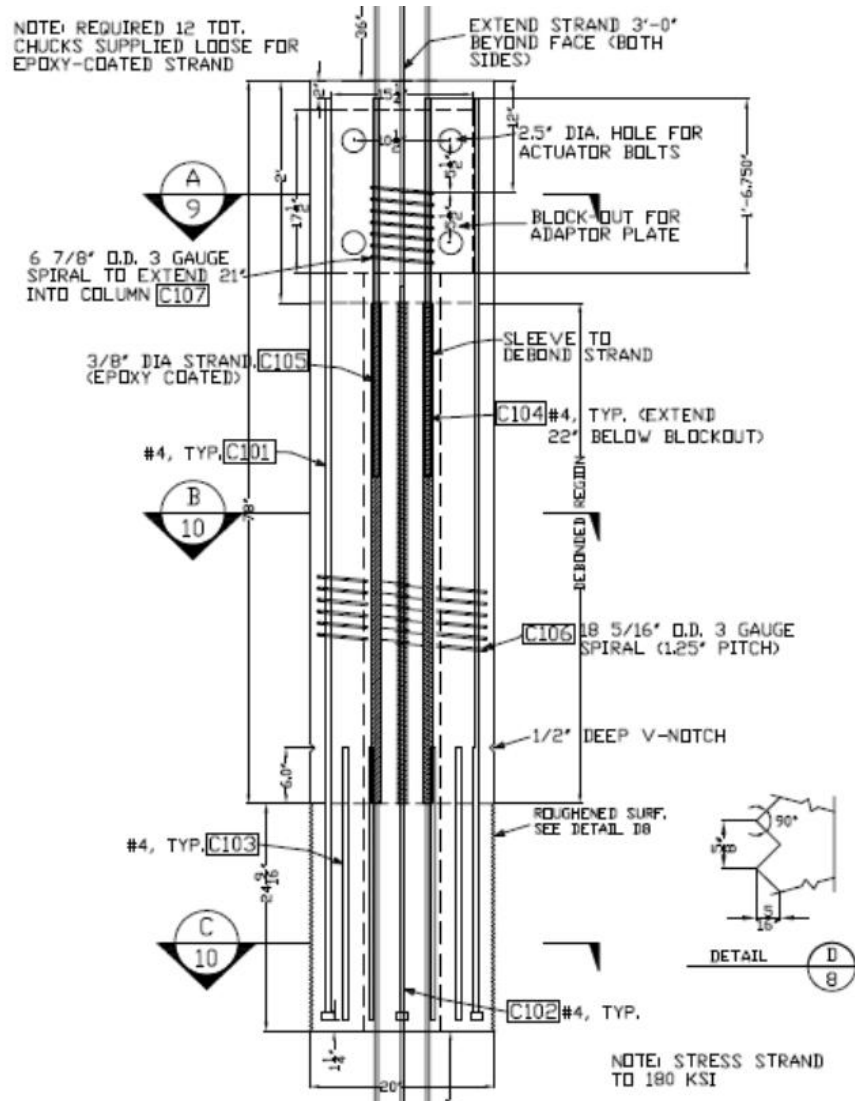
Specimen PreT-SF-CONC elevation (Davis et al. 2012)
